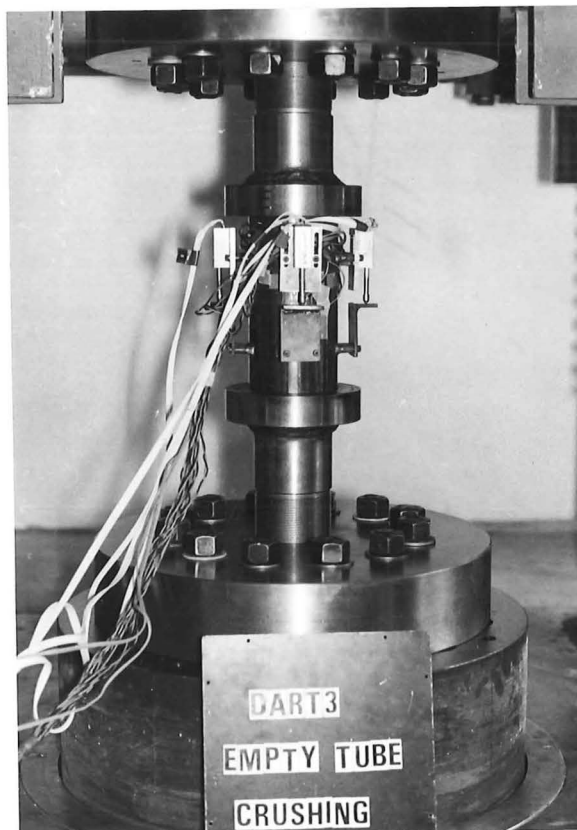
INSTRUMENTED TEST UNIT ASSEMBLY IN DARTEC TEST MACHINE
